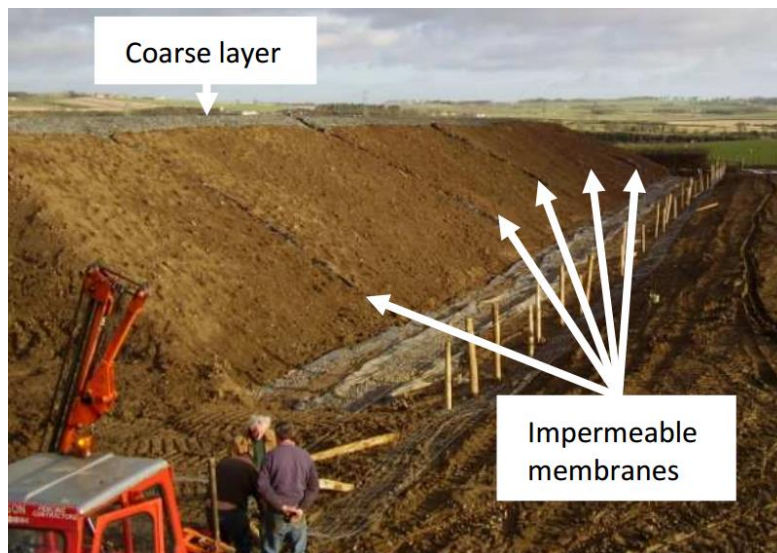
Photograph of full-scale embankment being constructed at Nafferton, showing sections separated by impermeable membranes (source: Hughes 2007)
